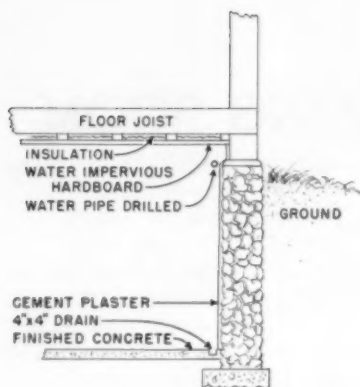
Egg-holding rooms below ground level are easier to keep cool than those above ground. Walls next to earthen embankments need not be insulated.
